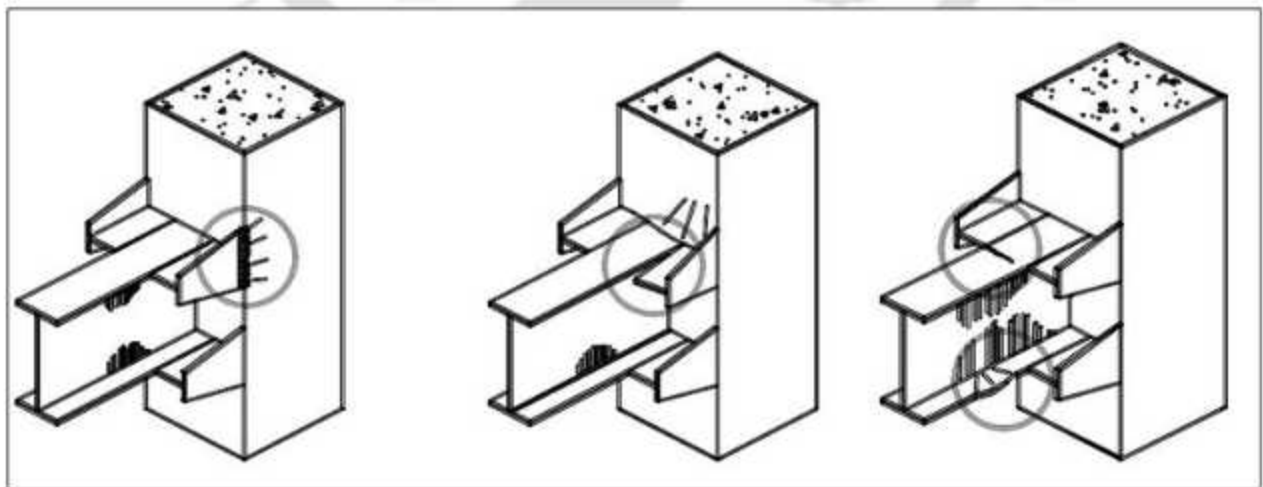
Steel beam-CFT connection with stiffener [41]
